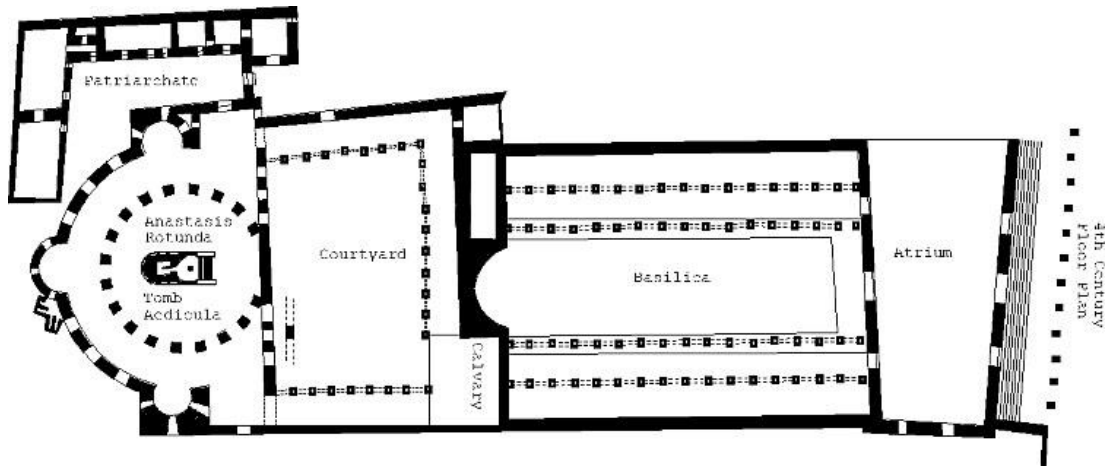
Sketch of the reconstructed floor plan of the Constantinian Church of the Holy Sepulchre with Anastasis, atrium, and basilica with galleries.
